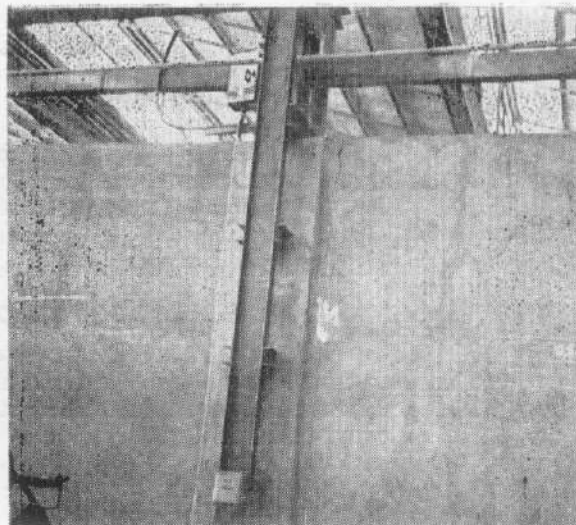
Brick masonry wall in the Wheeled Equipment Assembly Shop showing vertical cracks near the Junction of brick columns.
